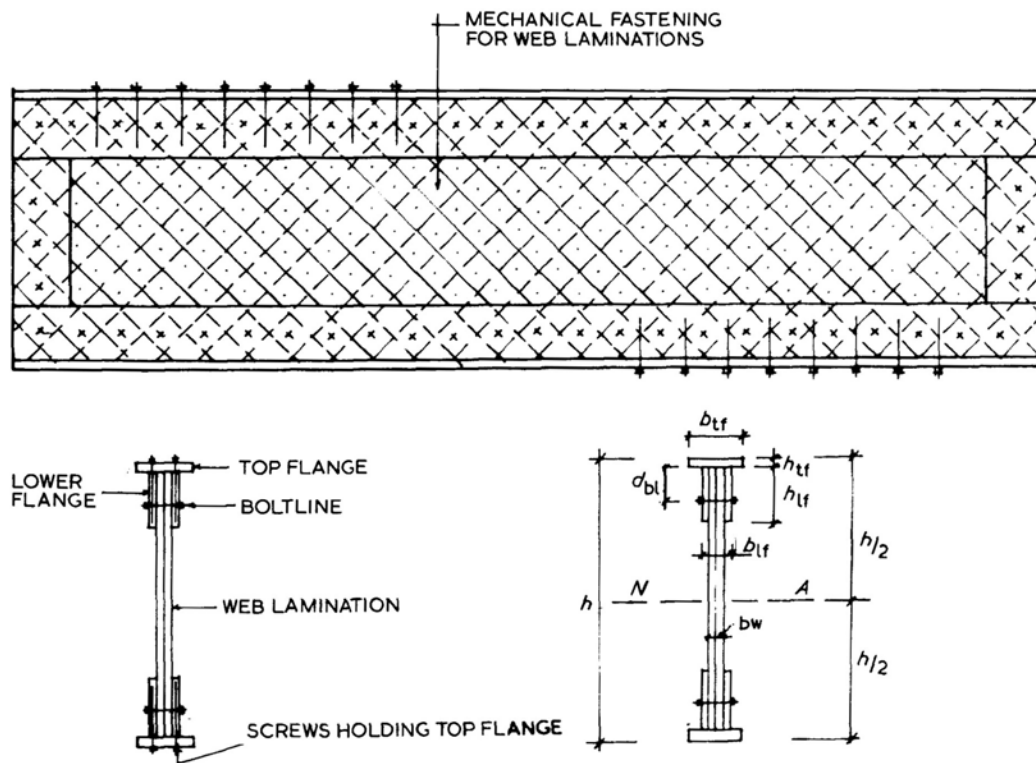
Schematic views and notation for Allotey Built-up Timber Girder (Allotey 1988)
